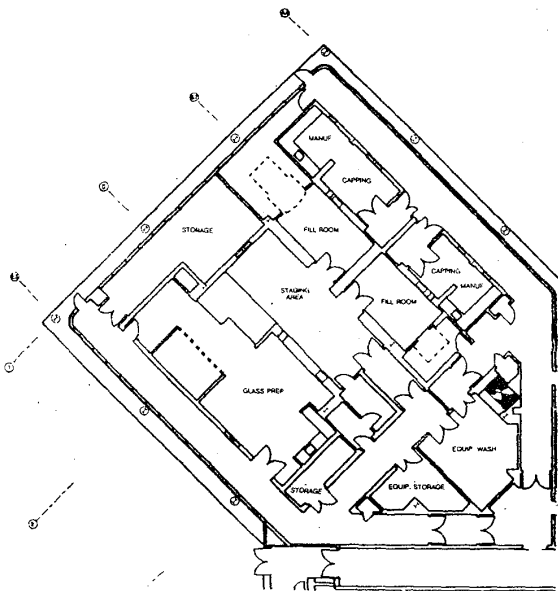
Floor plan of aseptic filling rooms and staging room with adjacent support areas (courtesy, Glaxo).
